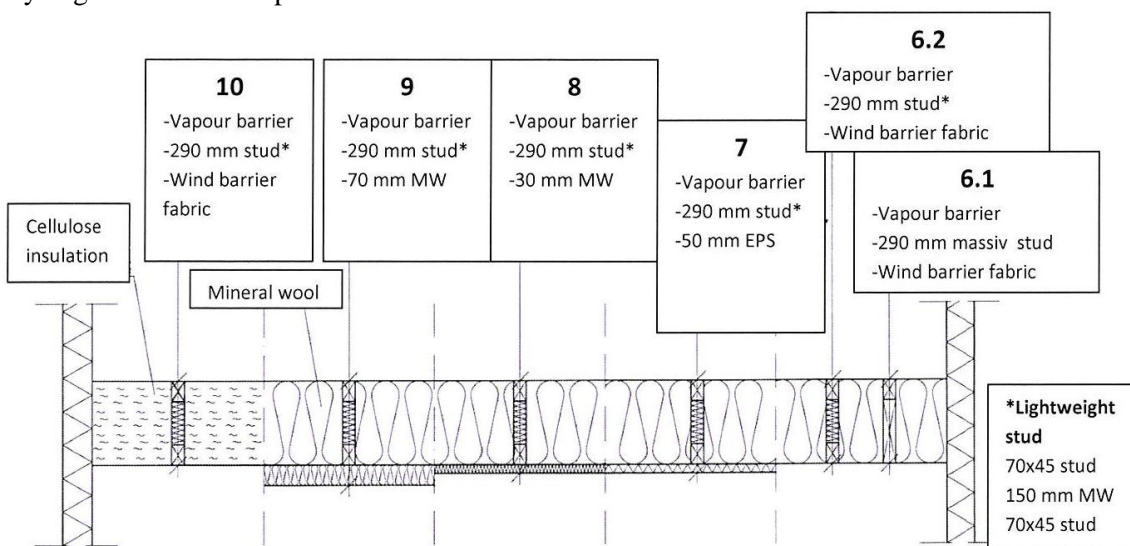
Horizontal section through the test wall, showing the different structural constituents.
